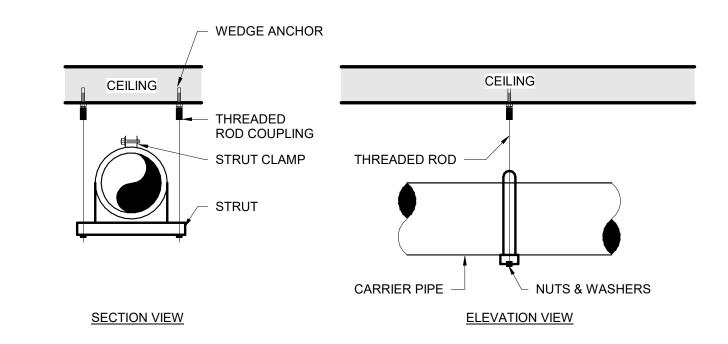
DETAILS ARE TYP THRUST BRACING METHODS & ARE NOT INCLUSIVE OF ALL SITE CONDITIONS. CONTRACTOR TO PROVIDE SHOP DRAWINGS OF BRACING METHODS FOR APPROVAL.
